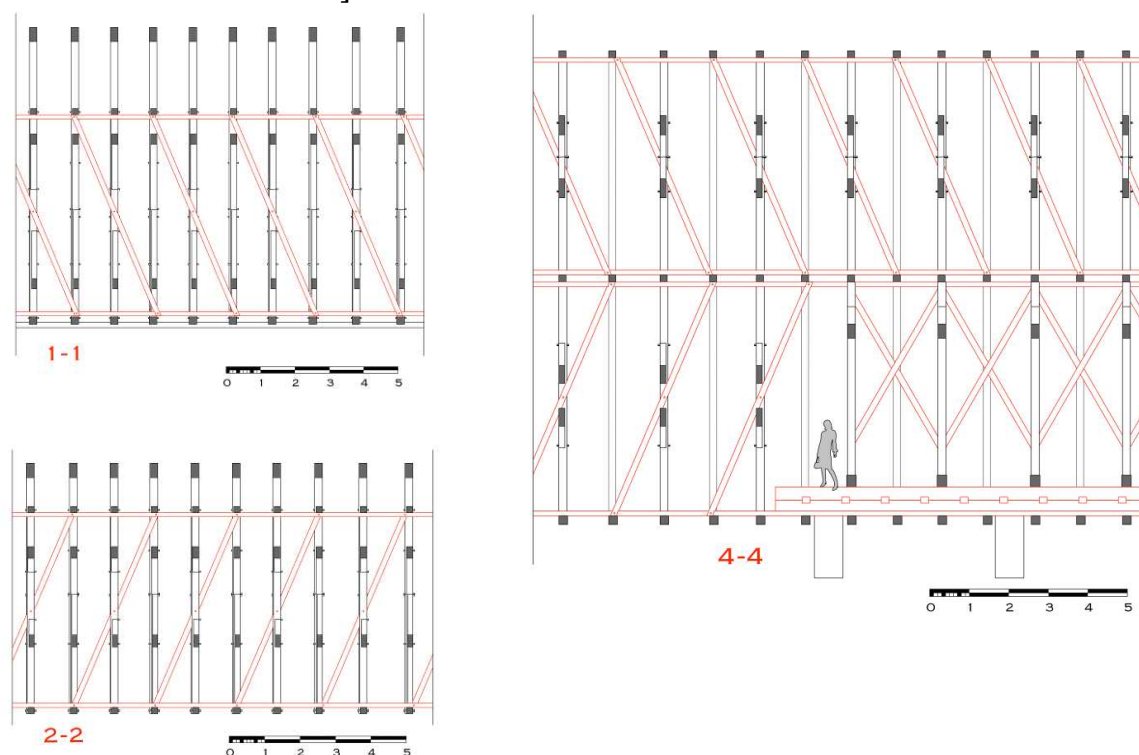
The longitudinal bracing plan systems – sections 1-1, 2-2, 4-4
